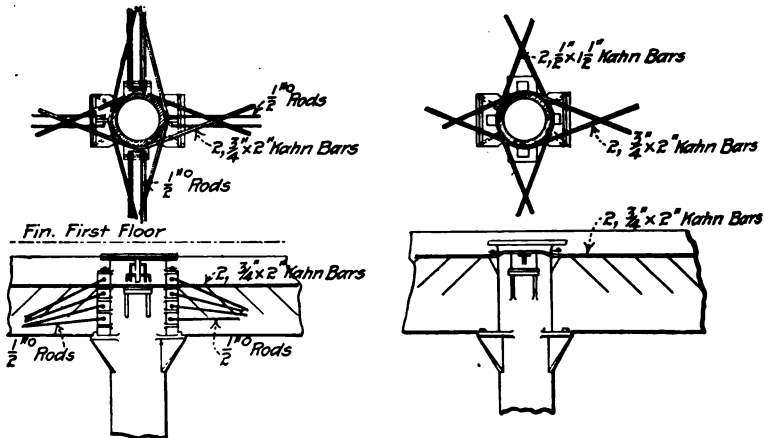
Column and Girder Construction, Twelve-Story Loft Building.
